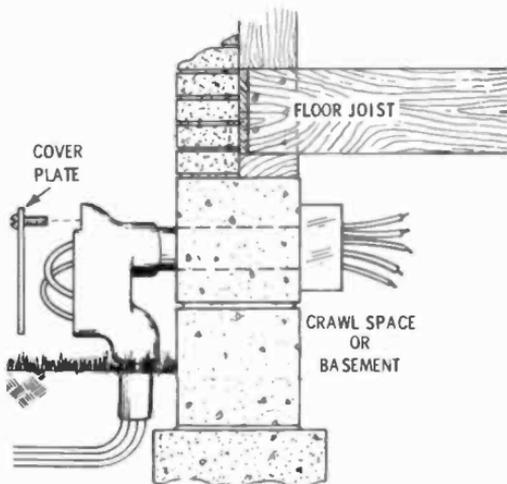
A waterproof elbow outside the house and garage joins sections of thin-wall conduit for underground cable entrances. The back plate is removable for handling the cable for a right-angle bend.
